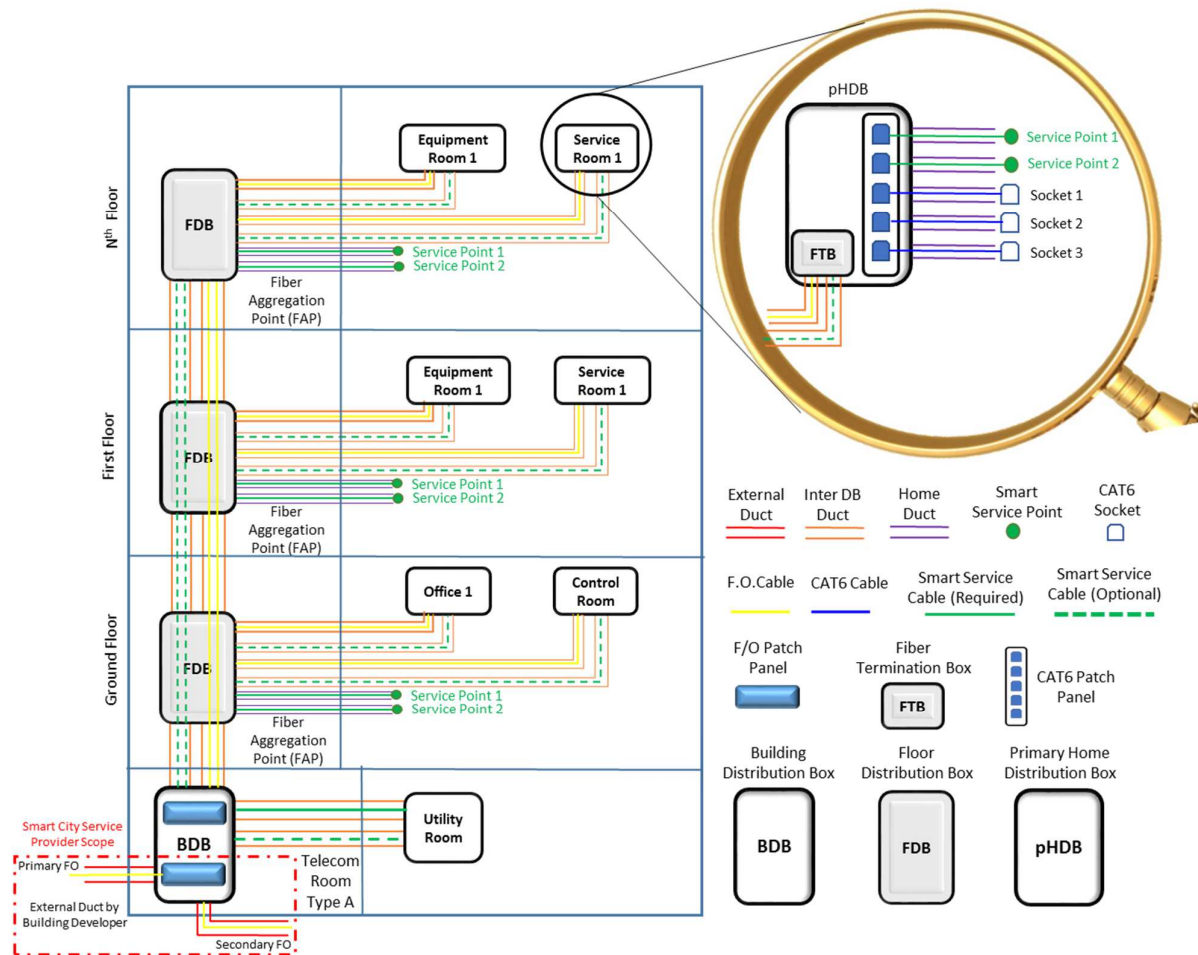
Utility Buildings (Substations/District Cooling Plants / Pump Station)
